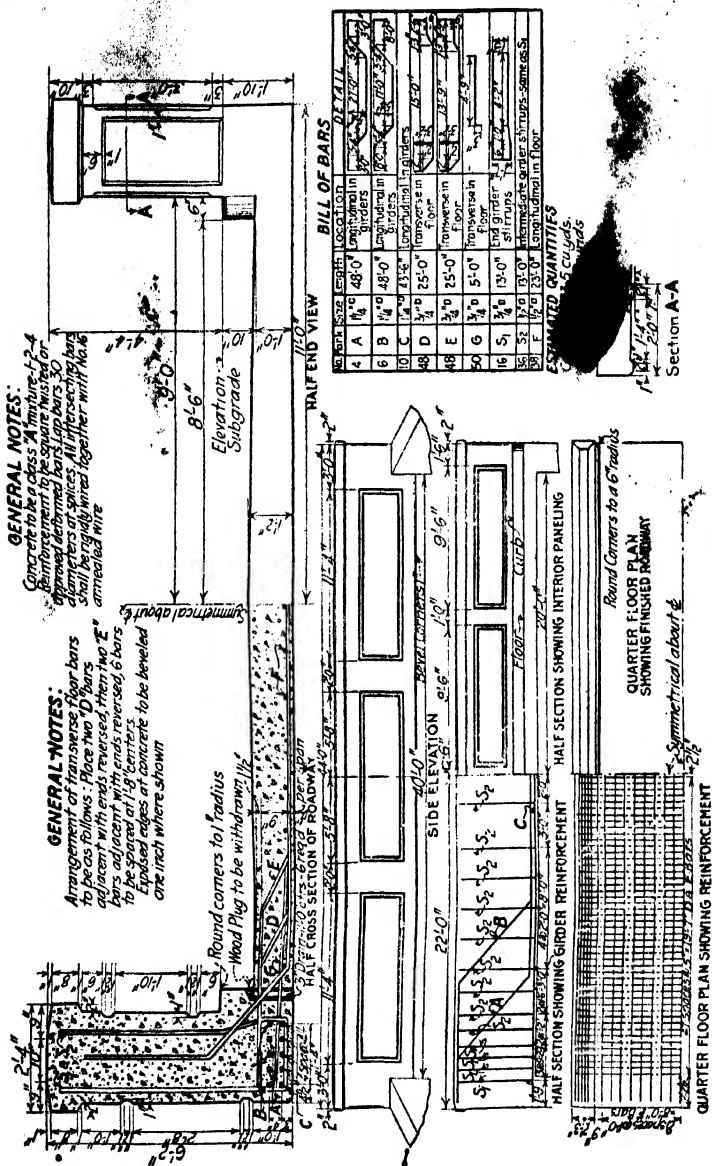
Details of reinforced concrete through girder bridge of the Wisconsin State Highway Commission.
